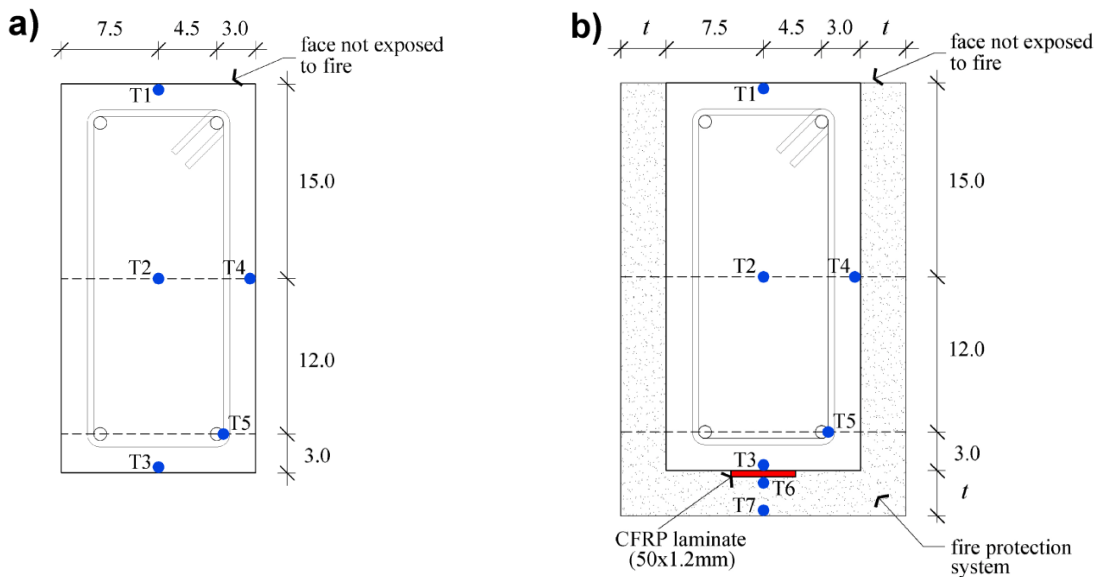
Location and nomenclature of thermocouples at Section S1 of (a) unstrengthened and (b) CFRP-strengthened RC beams (not declared units in cm)
